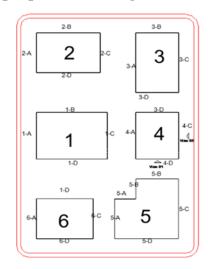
Project master plan, showing building numbers and elevation codes on site (Authors).
